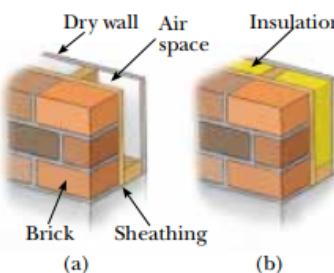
An exterior house wall containing (a) an air space and (b) insulation.
